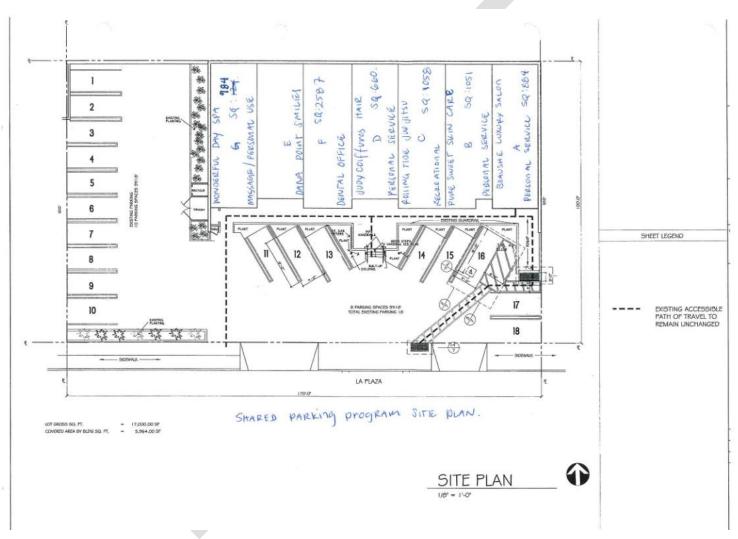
EXHIBIT A "SITE PLAN AND FLOOR PLAN"
